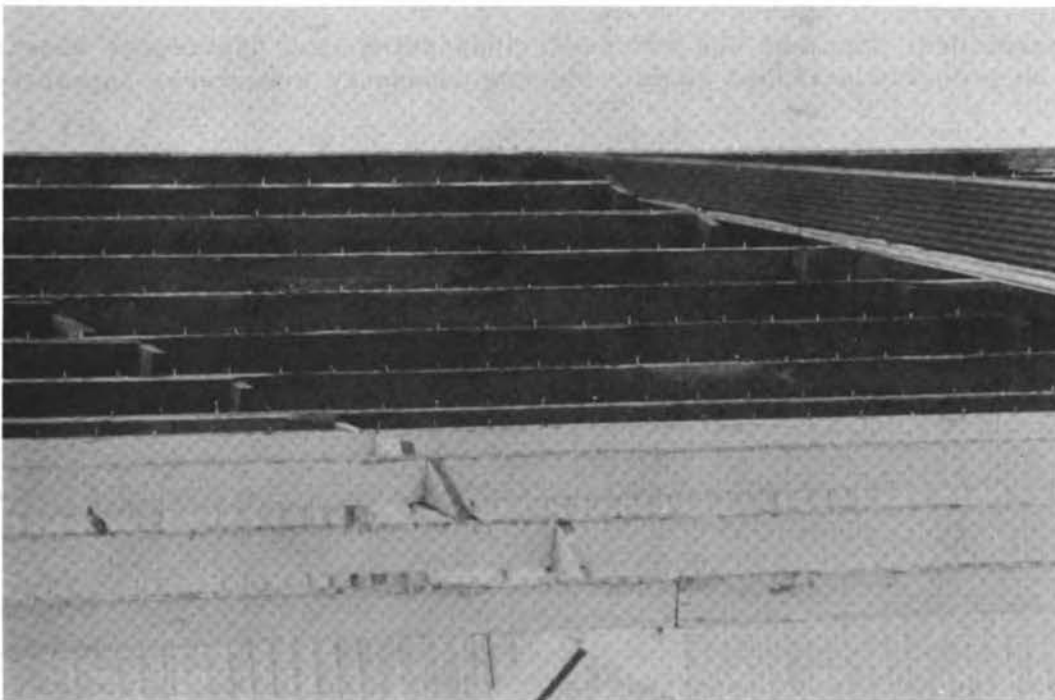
Nailing schedule for attachment of light-gage metal cladding to timber purlins.
